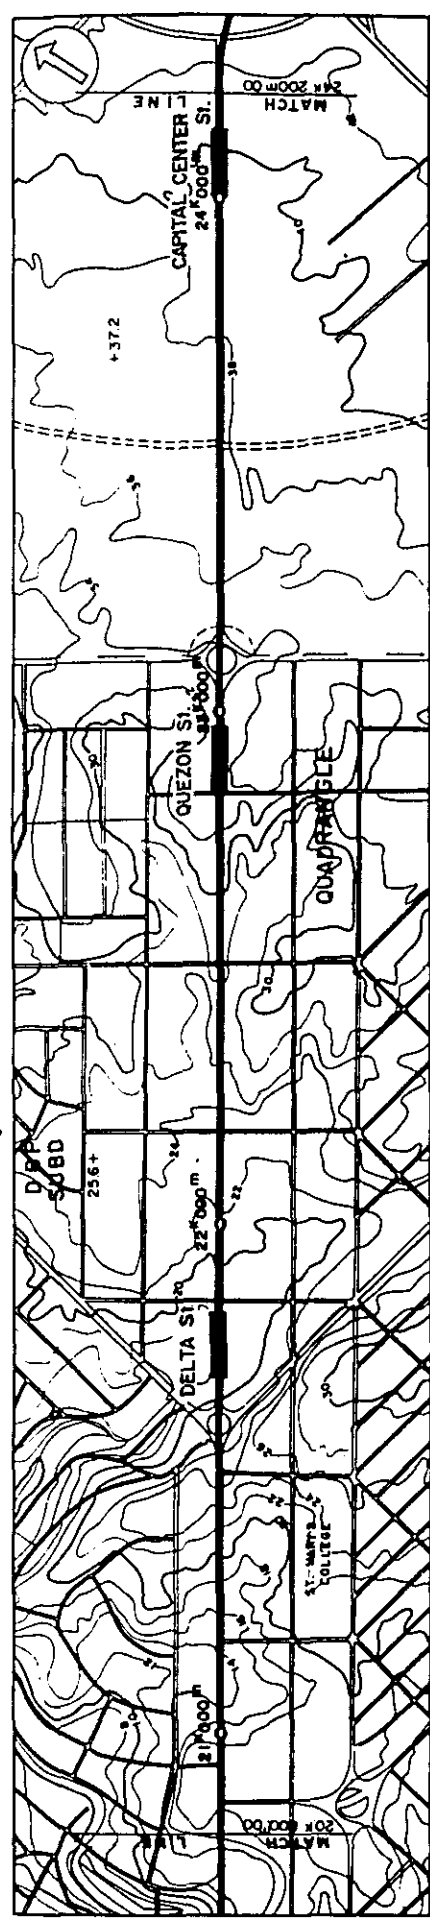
Plan and Profile for All Underground Alternative (1)
